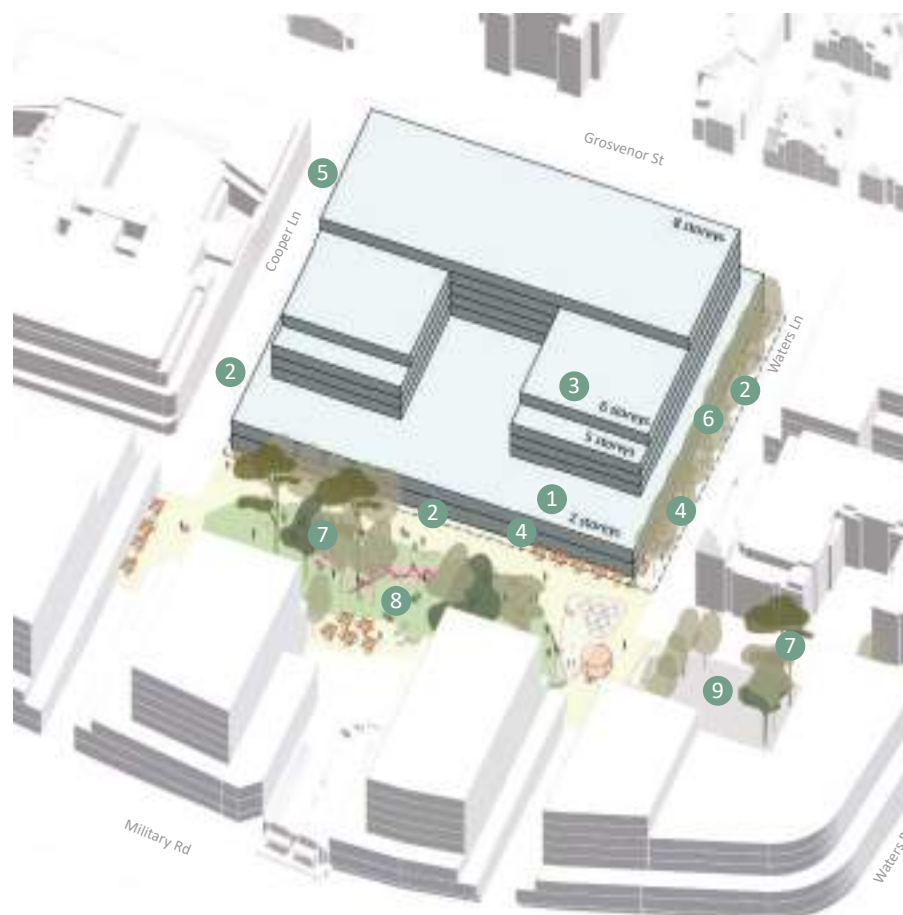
Illustrative Site 1 building envelope looking north-west
